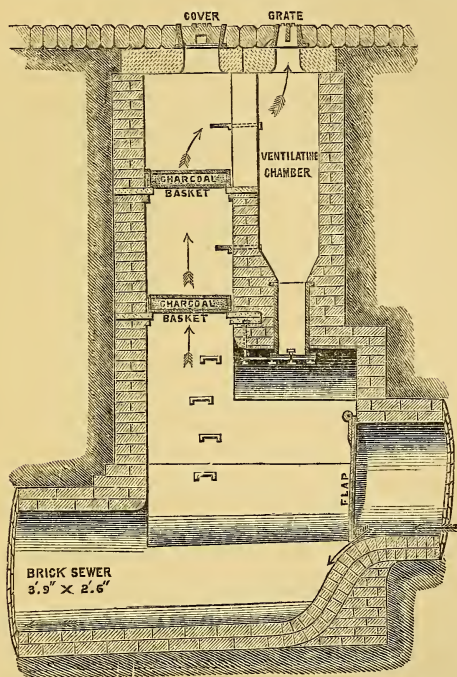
Manhole, Tumbling Bay, and Double Ventilating Arrangement.
